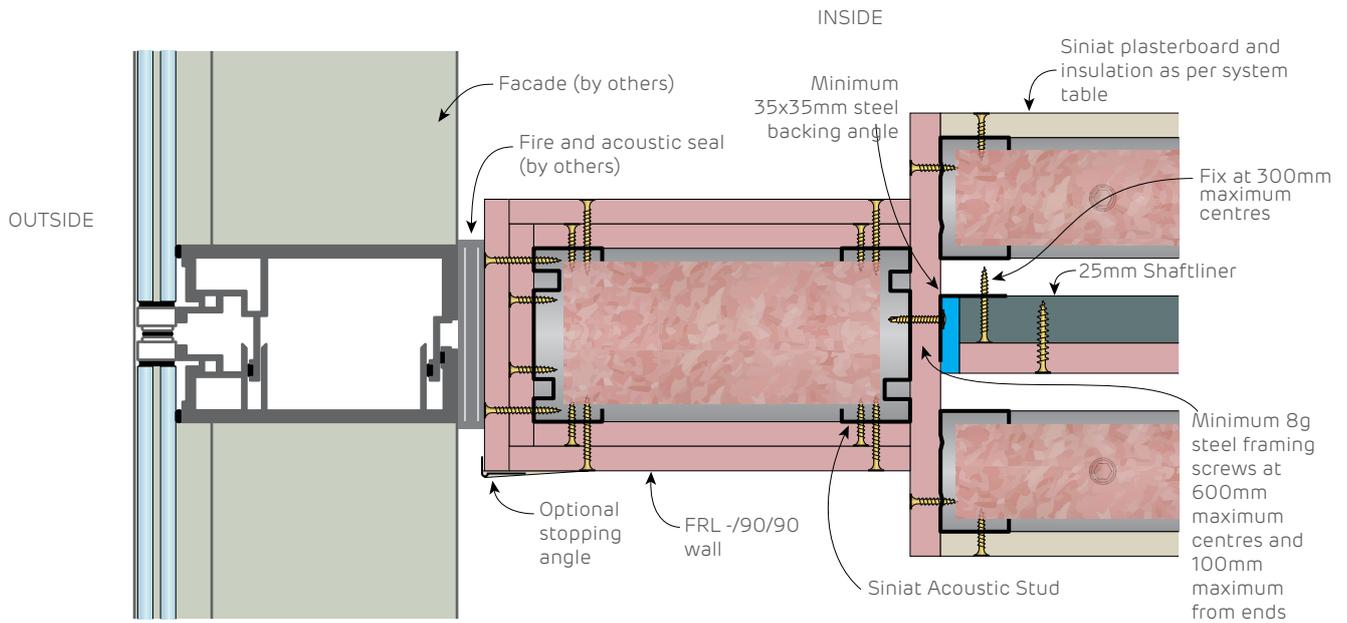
Interhome Highrise Wall Transition to Curtain Wall Mullion Plan
